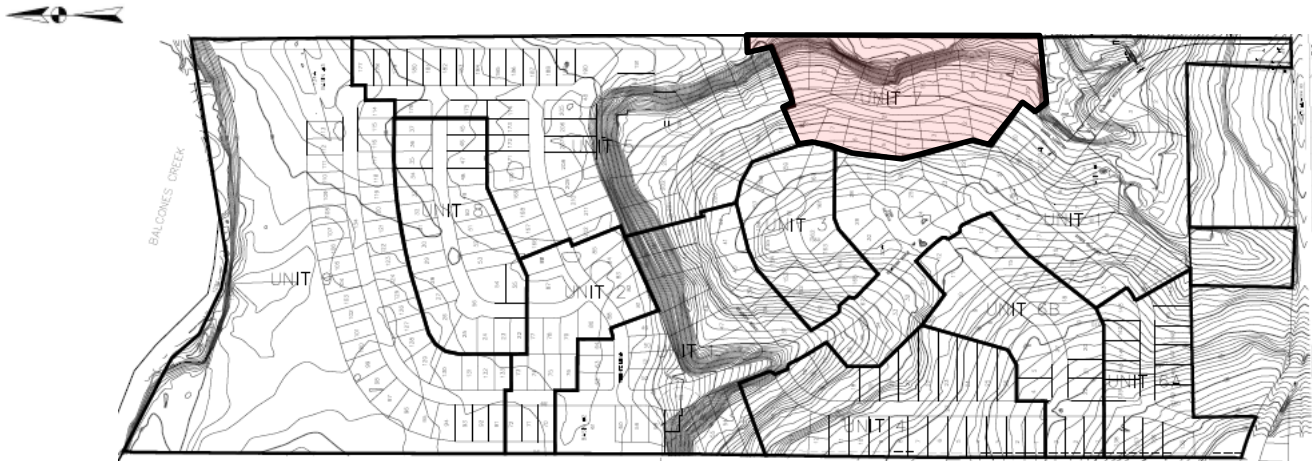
Exhibit B: Elkhorn Ridge Subdivision Master Plan (Unit 7 Highlighted)
